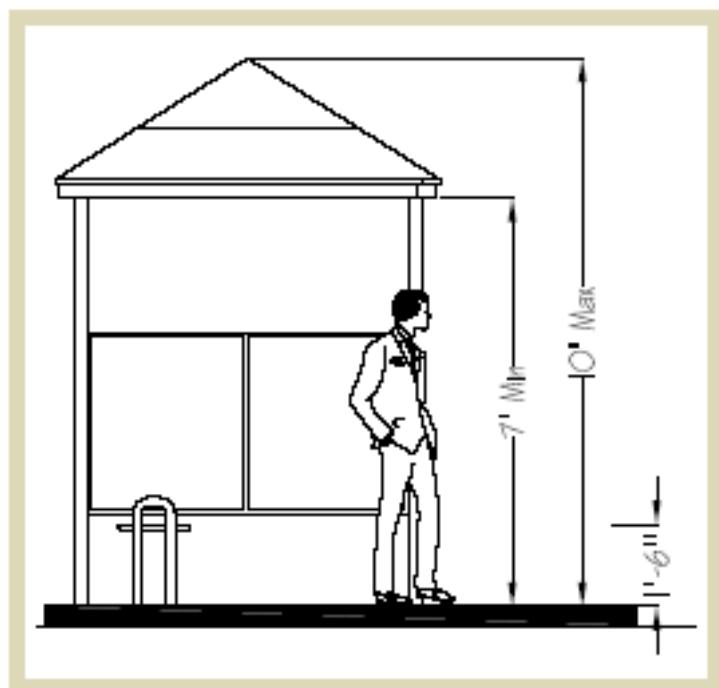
| Cross section of a mid-sized bus shelter, with typical vertical dimensions.
